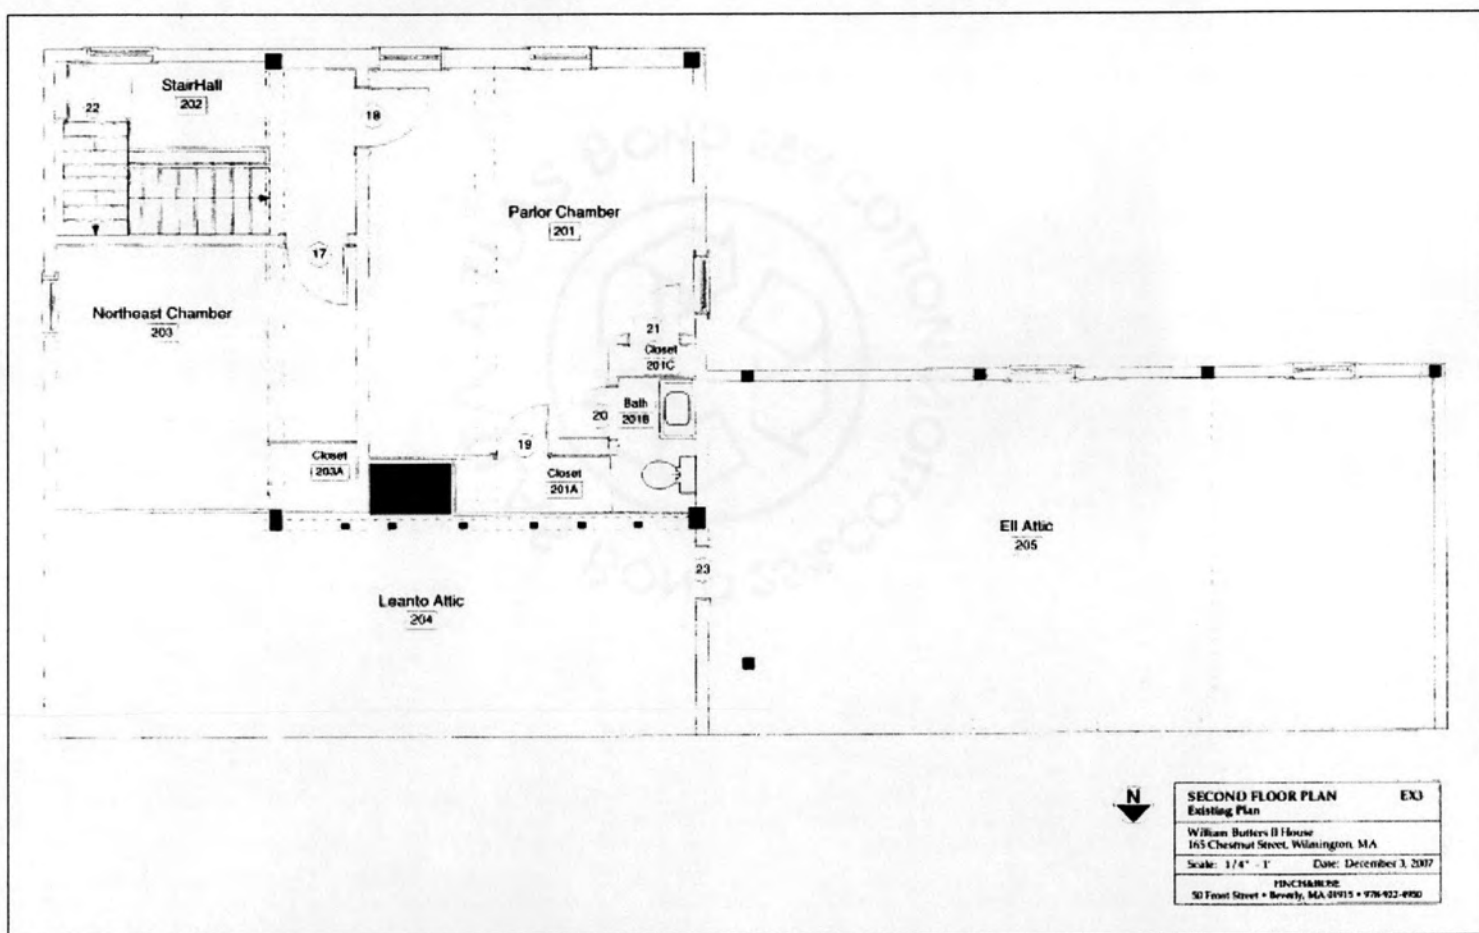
Second Floor Plan, existing conditions. Drawing by Finch & Rose, 2007.
